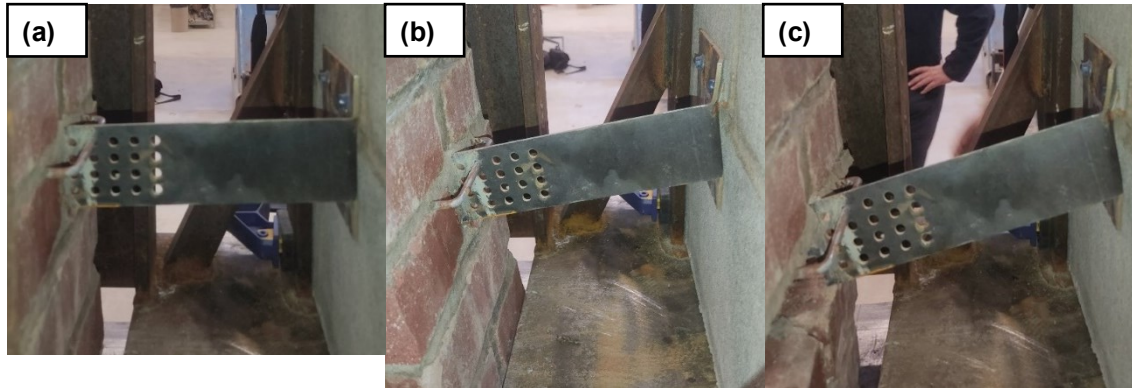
Failure of VC tie (75 mm embedment): a) specimen before test, b) deformation of tie, and d) collapse of veneer.
